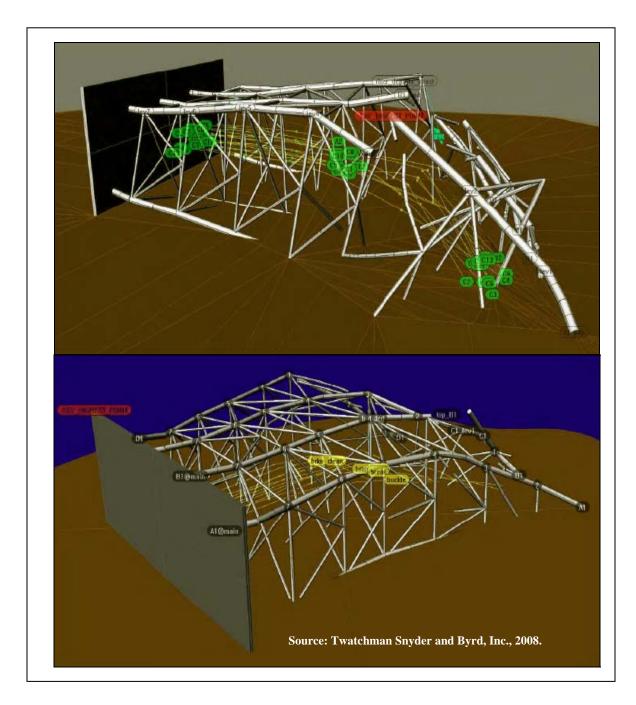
Model Rendition of Hurricane Destroyed Structure Lying Horizontally on the Seafloor.
